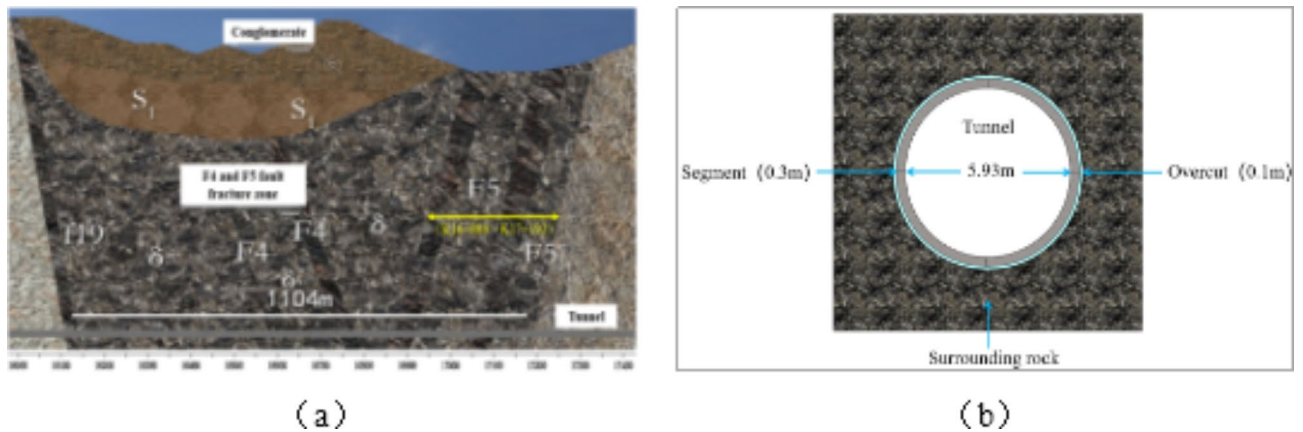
Diagram of engineering geological and tunnel excavation section.
